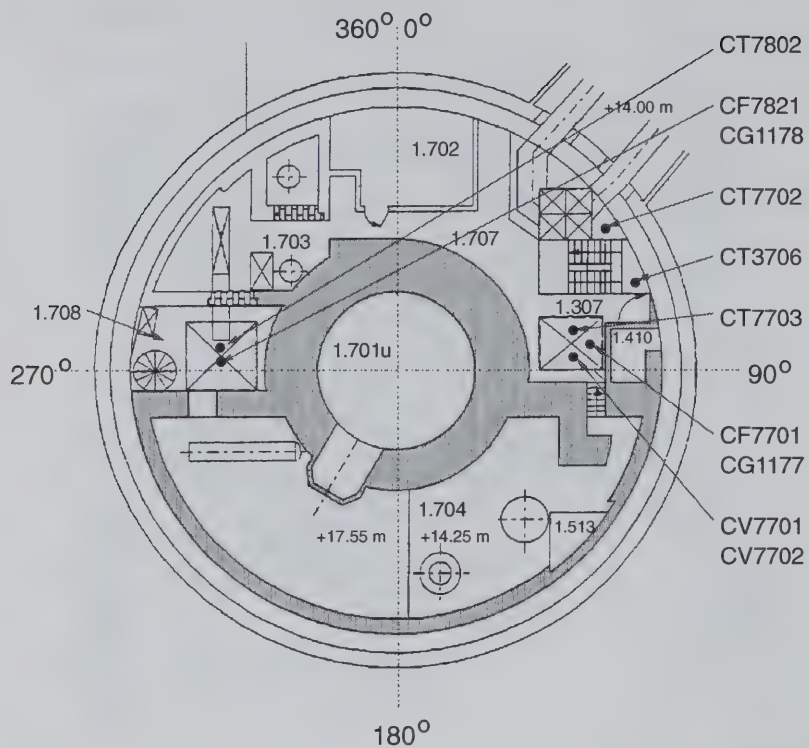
Level 1.700 at the +17.0 m Elevation
